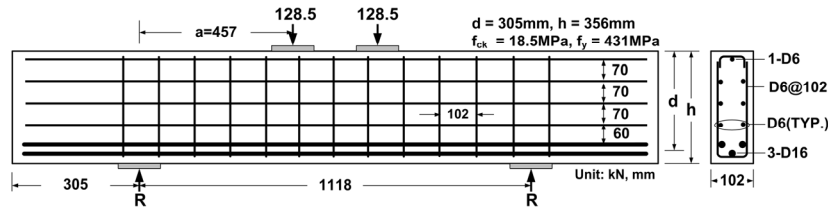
Geometrical shape and reinforcement details of beam 4C3-04 (from Smith & Vantsiotis⁸⁾)
